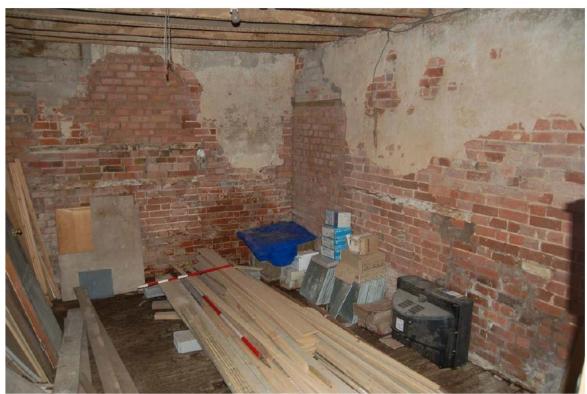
South range, interior; Room GF03 looking north-west, NB. blocked window (left) and door (right).
